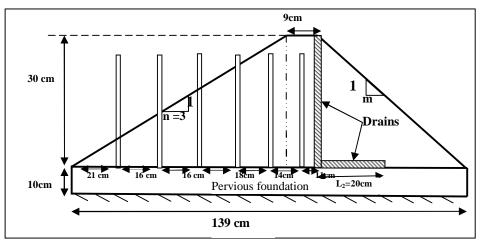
(b) : Detailed view of earth dam on an pervious foundation
